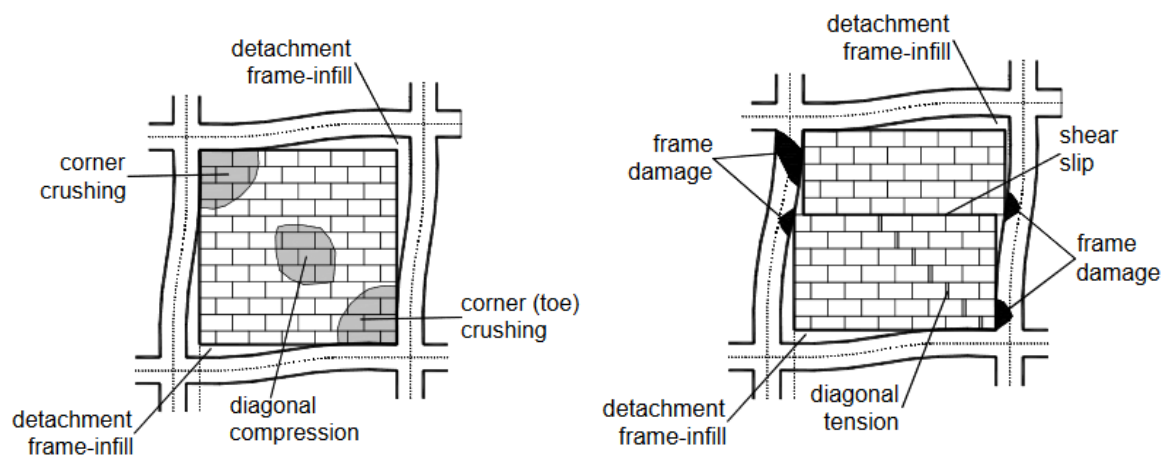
all failure modes of in-plane infill masonry (after Kumar & al 2017)
